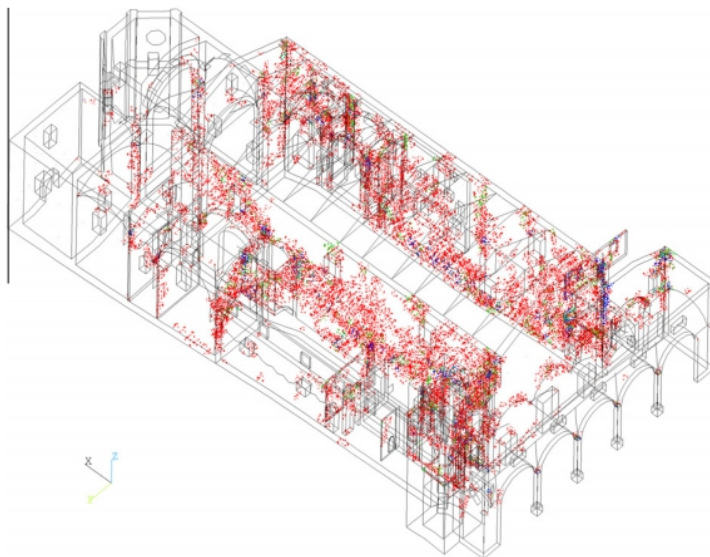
Cracking pattern of the masonry structure (Betti & Vignoli, 2011)
